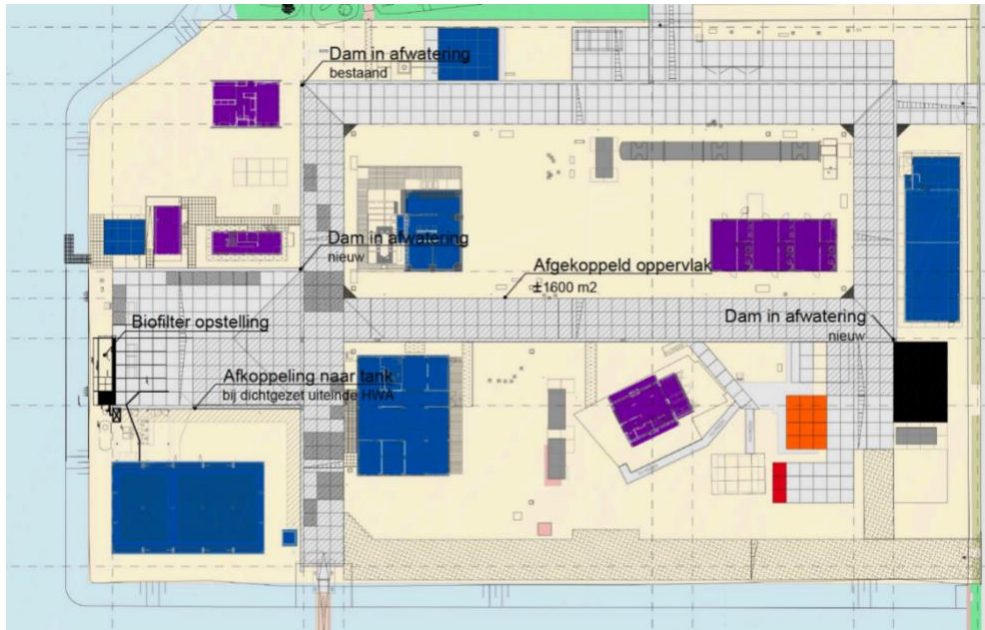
The Green Village: Building layout and impermeable surface area for rainwater collection (1600 m²)
